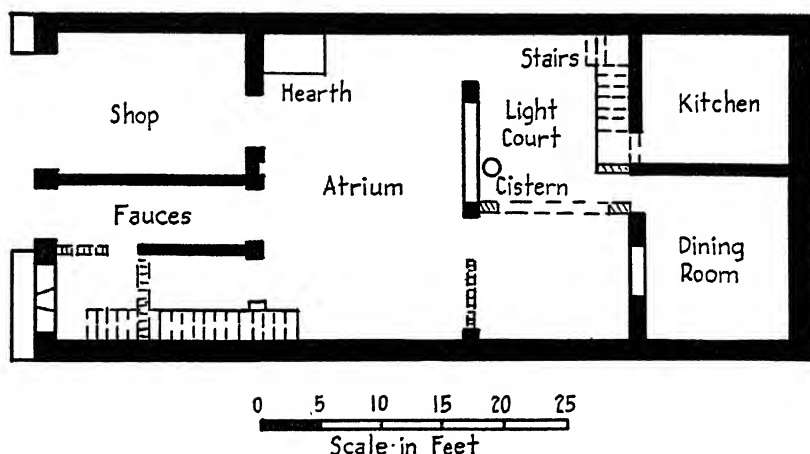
PLAN, ROMAN HOUSE WITHOUT COMPLUVIUM
